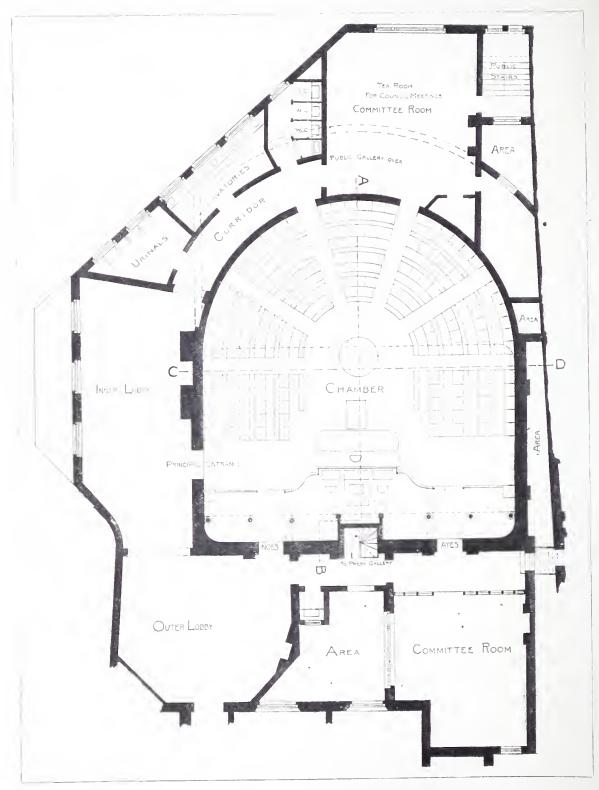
GENERAL PLAN. Scale of about 16 feet to one inch.
